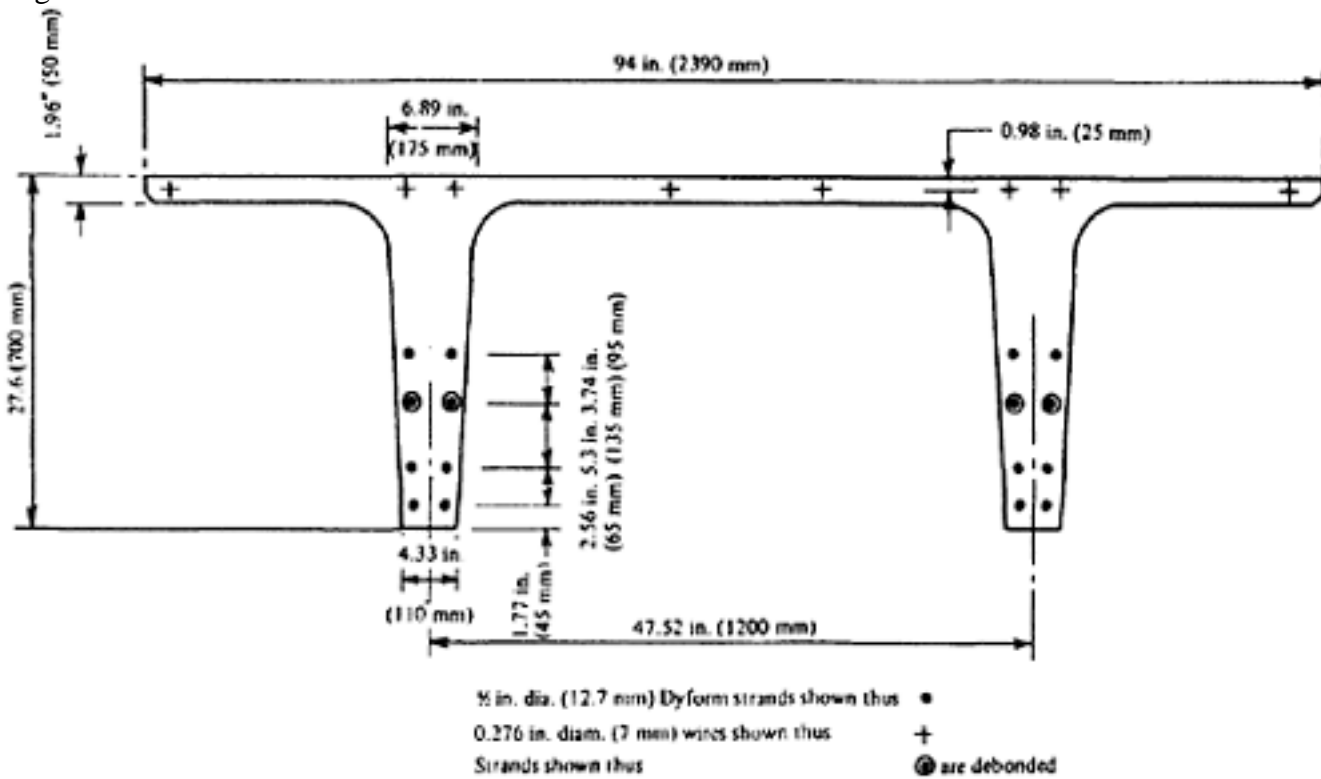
Cross-section of double-T beam (example 9.2.6)
